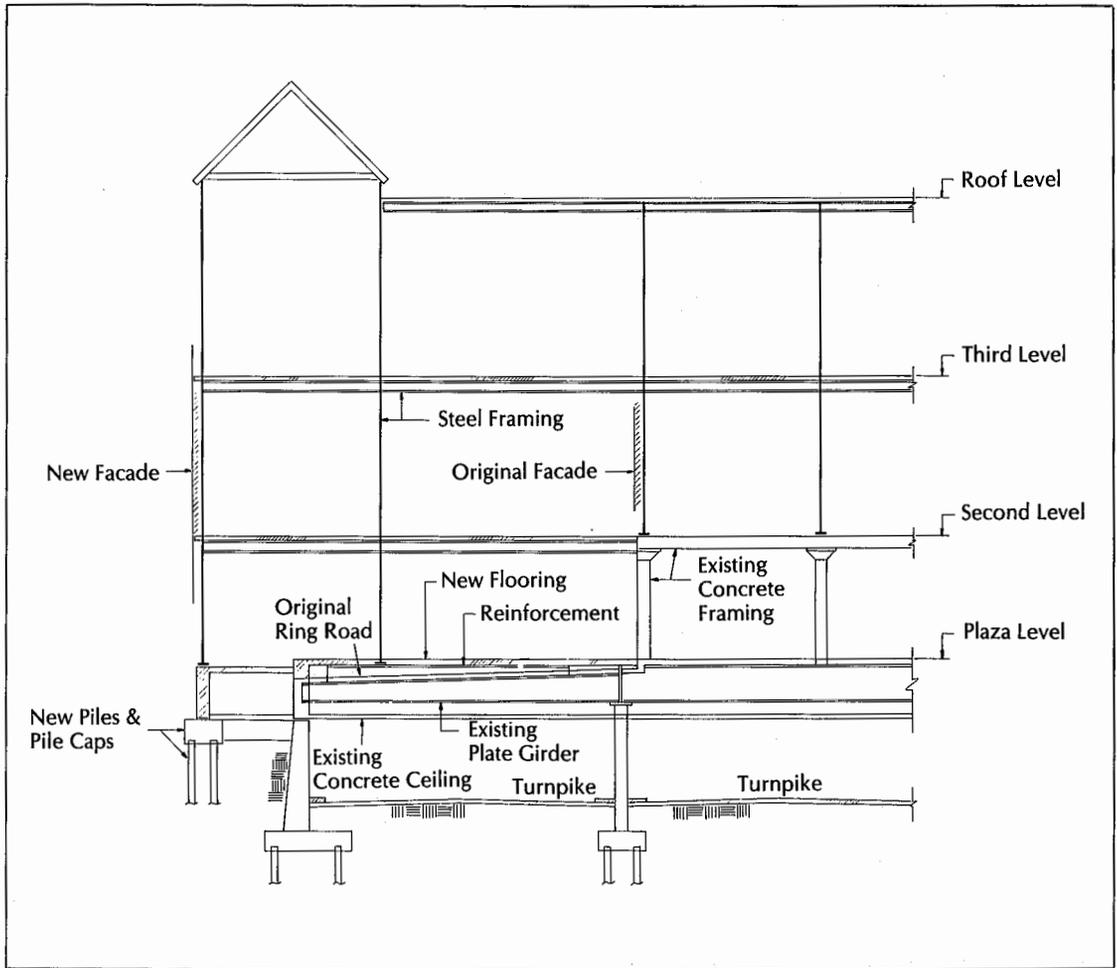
A cross-section of the Hynes expansion to the north into the Ring Road area and towards Boylston Street.
